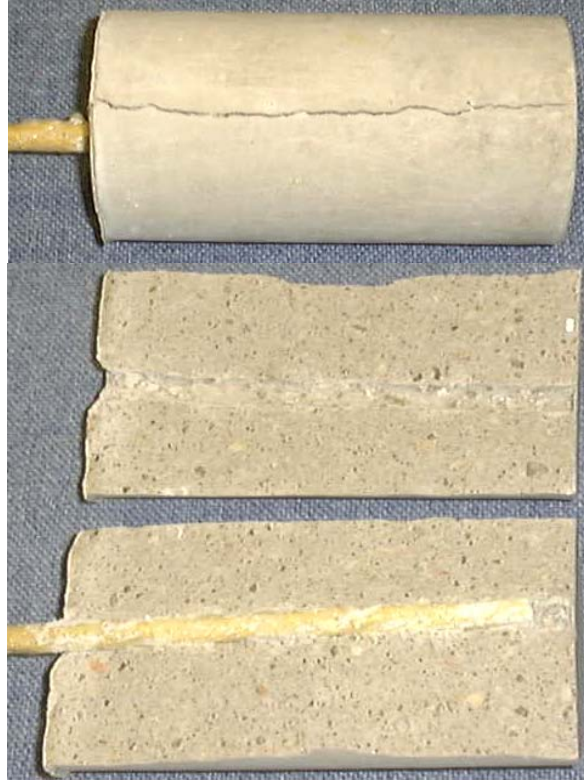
Pullout Failure of Bars Embedded in Cylindrical Concrete End Tabs.
